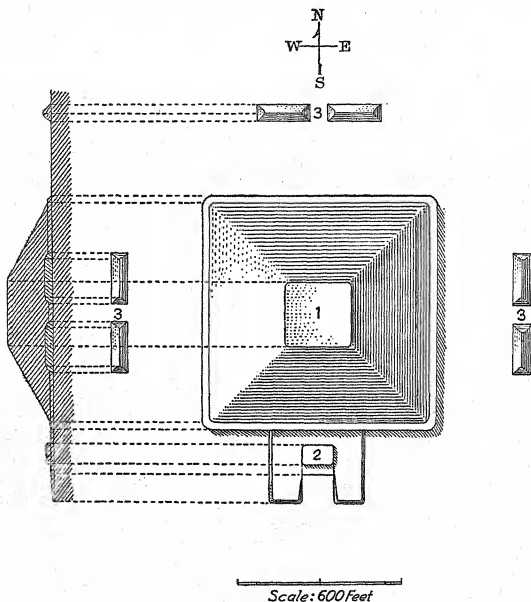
Plan and elevation of grave mound of Han Wu Ti.
